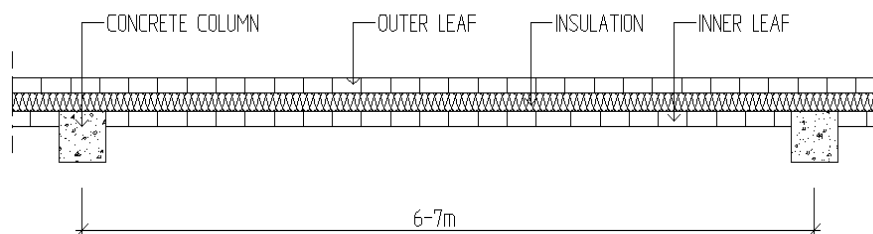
Horizontal section through the external cavity walls, Municipal Bath, Lund, Sweden.
